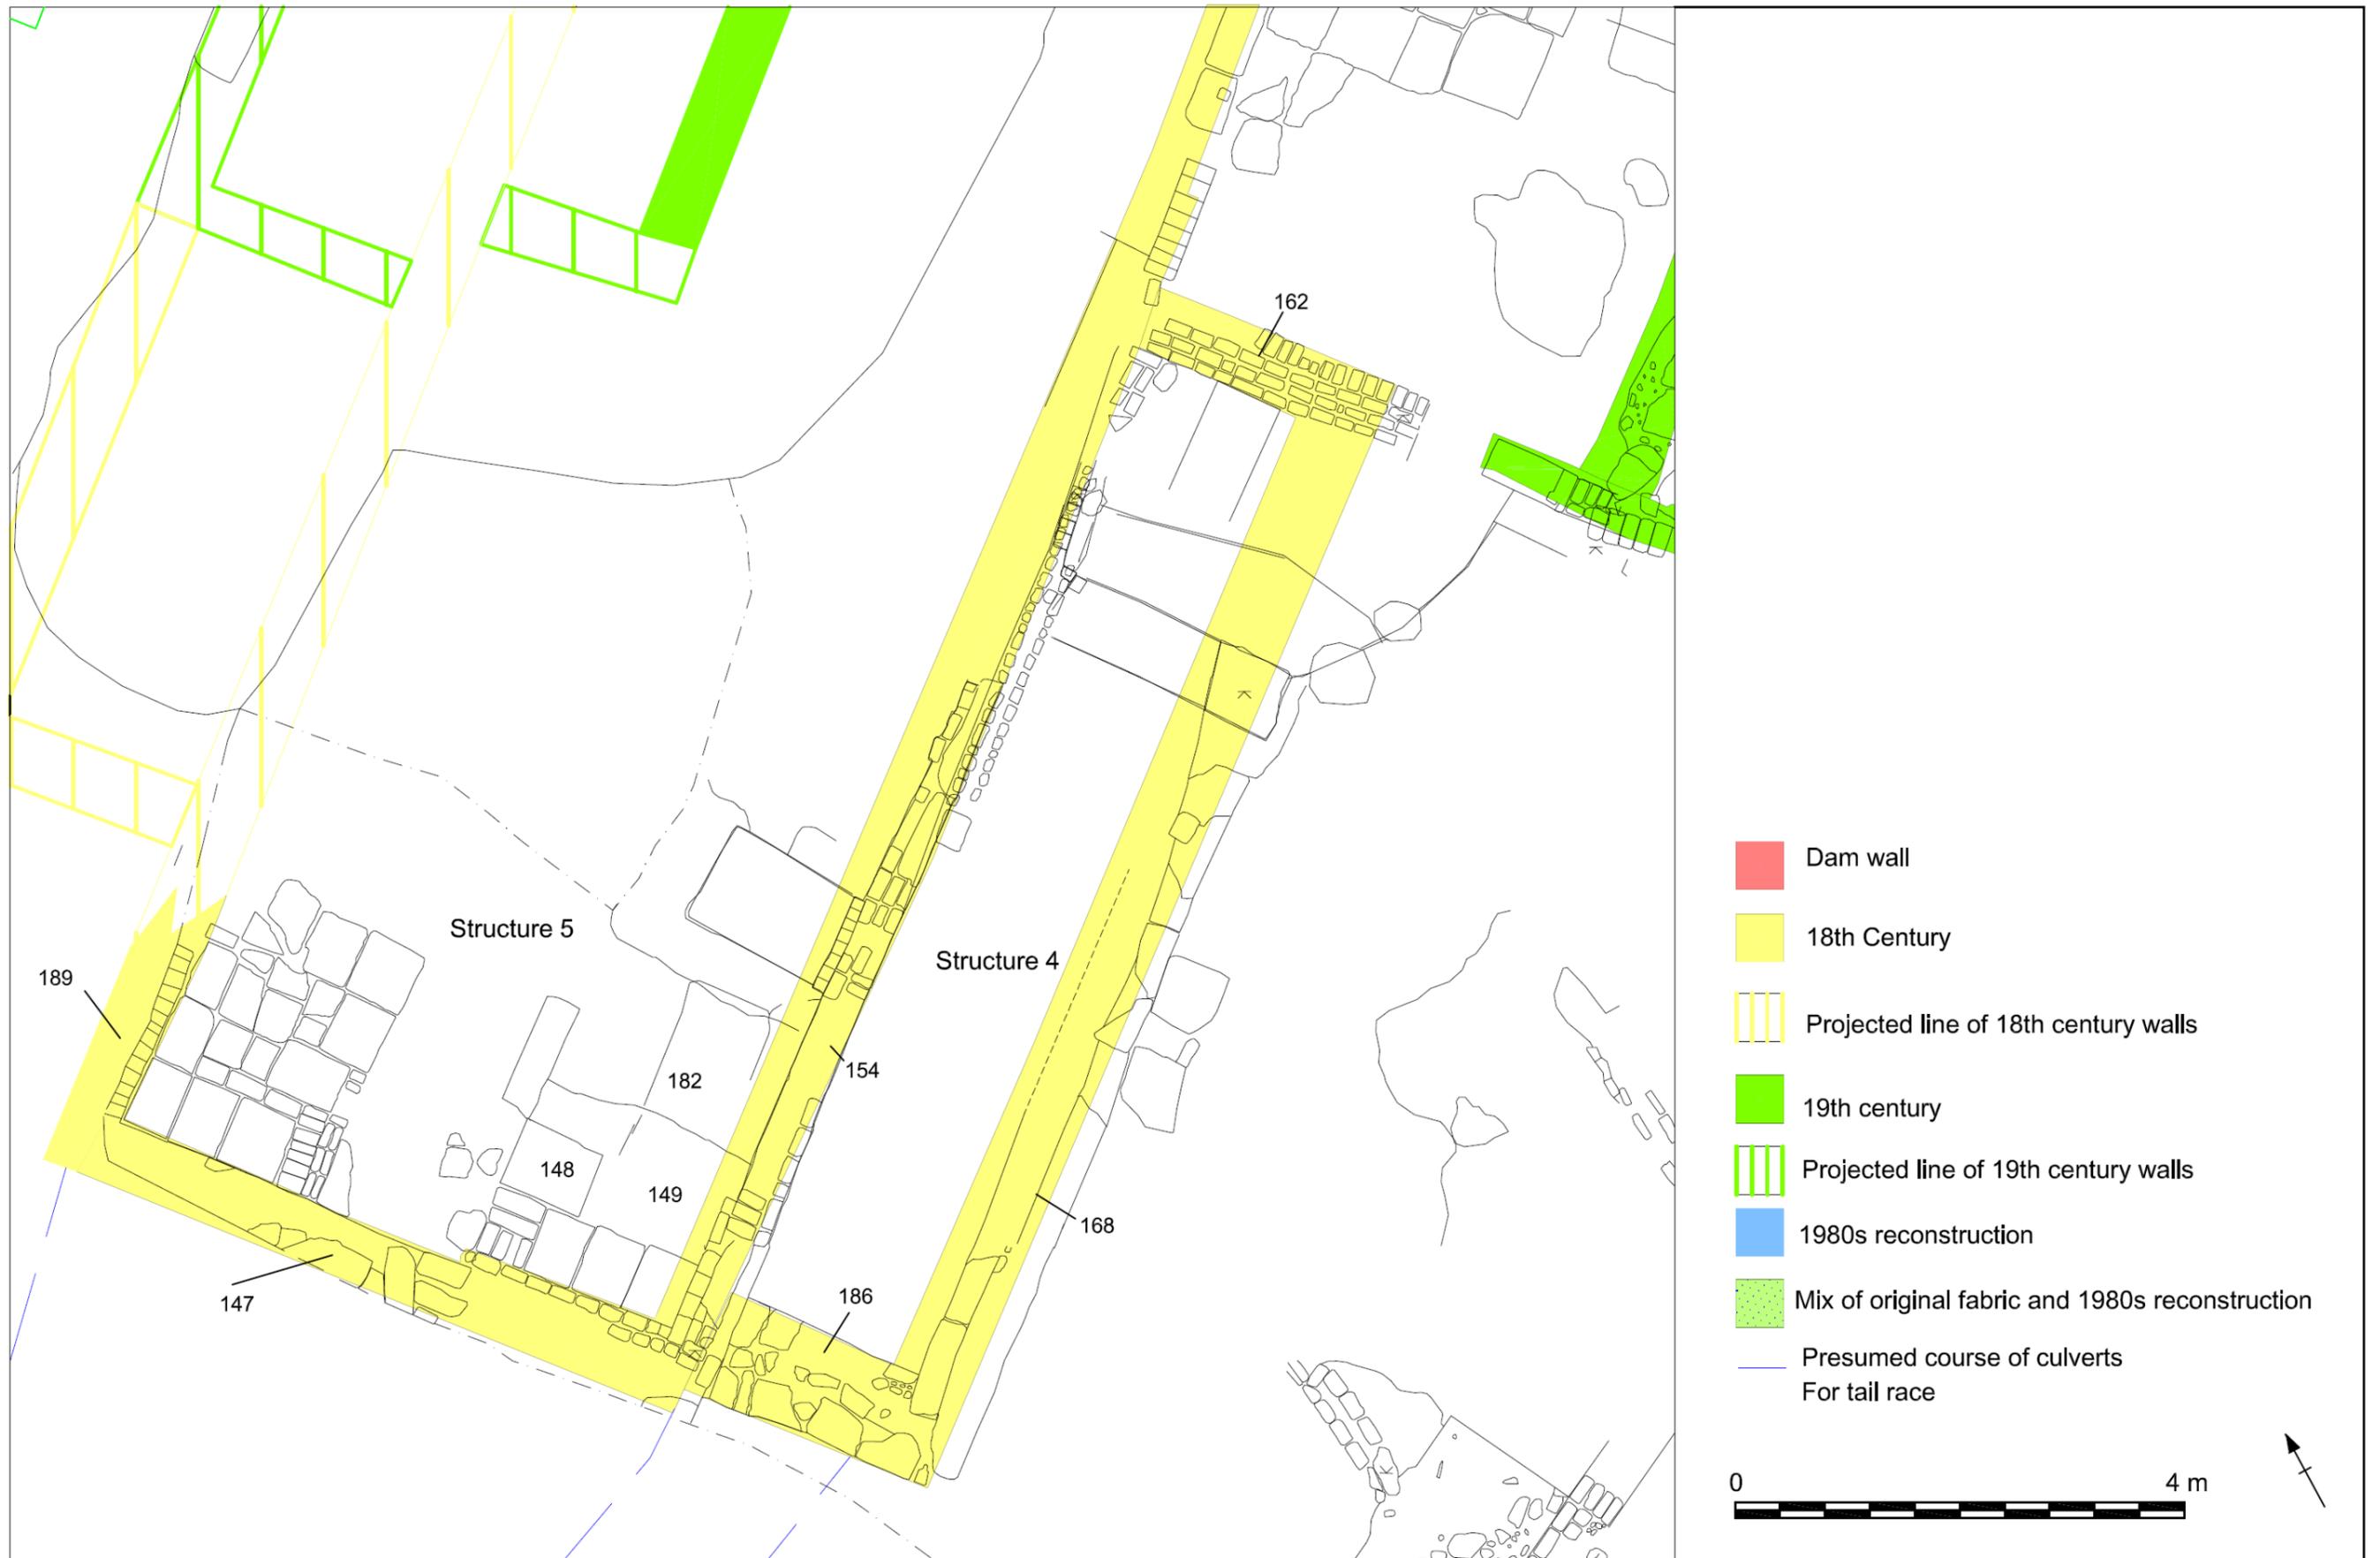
Plan of central section of excavated area around southern wheel pit.
